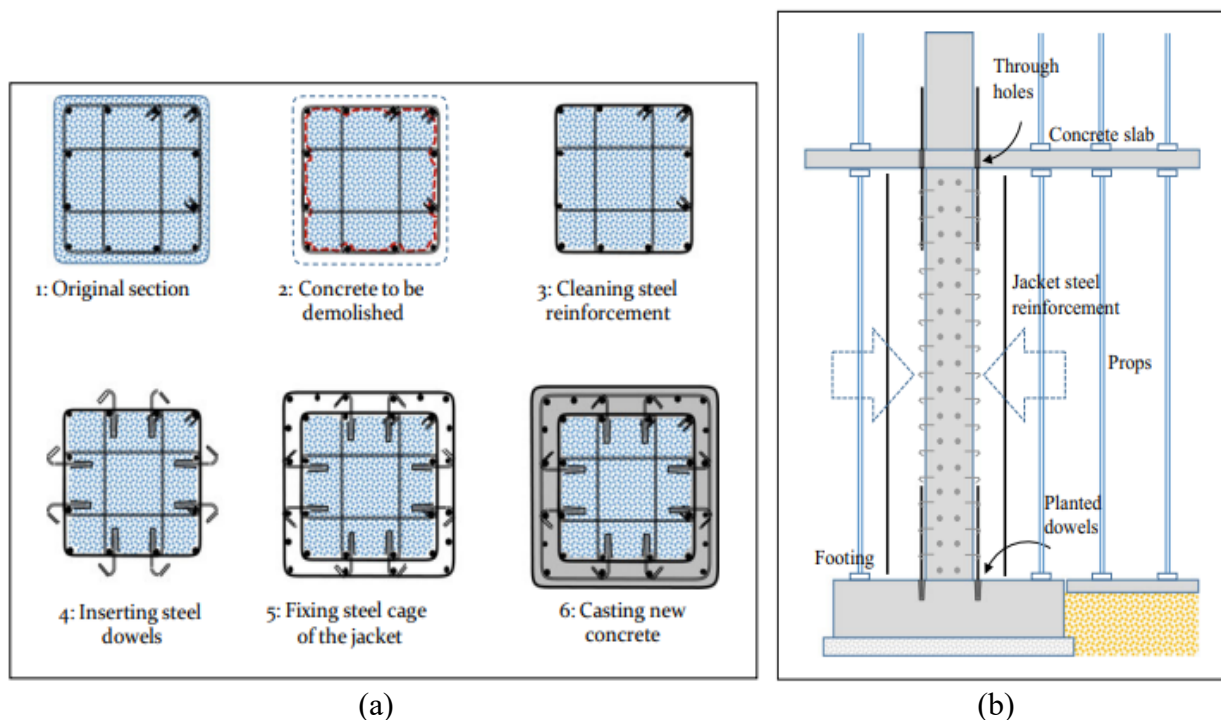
Column jacketing; (a) construction steps for the concrete jacket, (b) concrete jacket in progress (Abdelrahman 2023).
